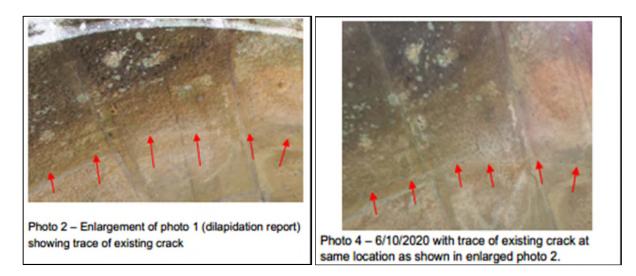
Pre-mining and current photos of the crack at culvert 89.629 km (source: PMLL Detailed Monitoring Report 47, Appendix E).
